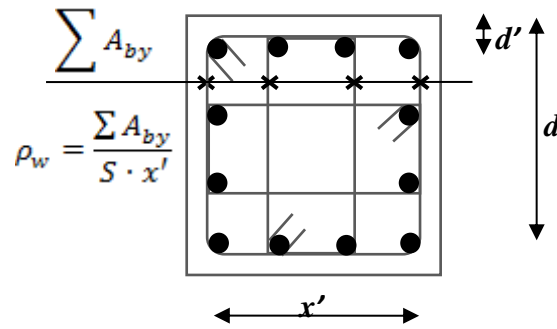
Definition of terms for calculating the transverse reinforcement ratio (S : stirrup spacing)
